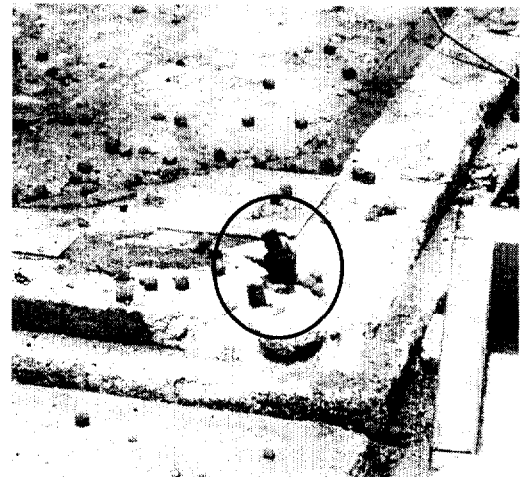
Evidence of pullout of nails used to fasten sill plates to concrete foundation.
